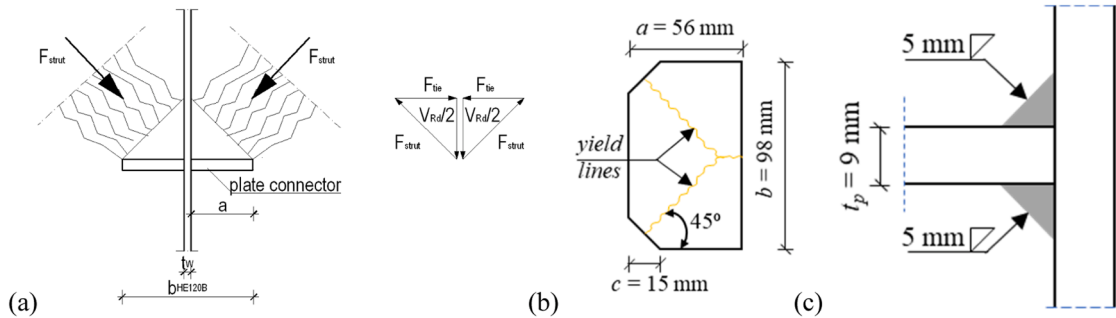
(a) Strut & tie model to determine plate connector strength, (b) internal bearing plate yield line pattern (fixed condition) and (c) weld dimensions of the plate connector.
